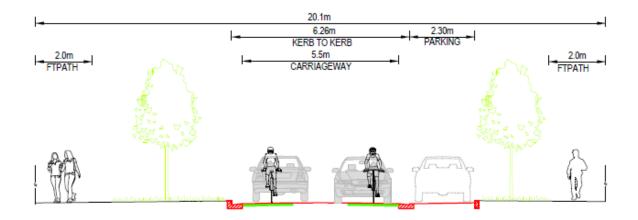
Proposed cross-section with parking (staggered along the street)
